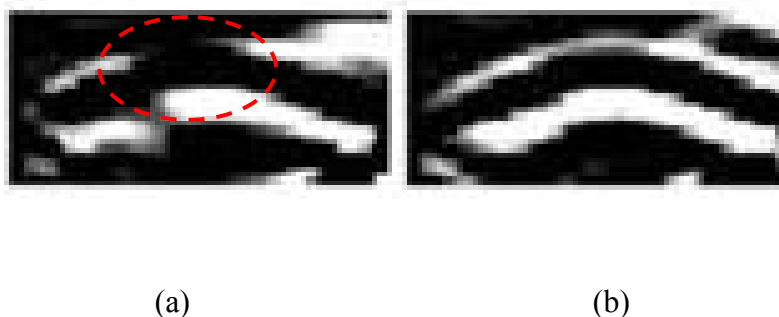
Signal contrast between (a) a damaged pipe and (b) an undamaged pipe.
